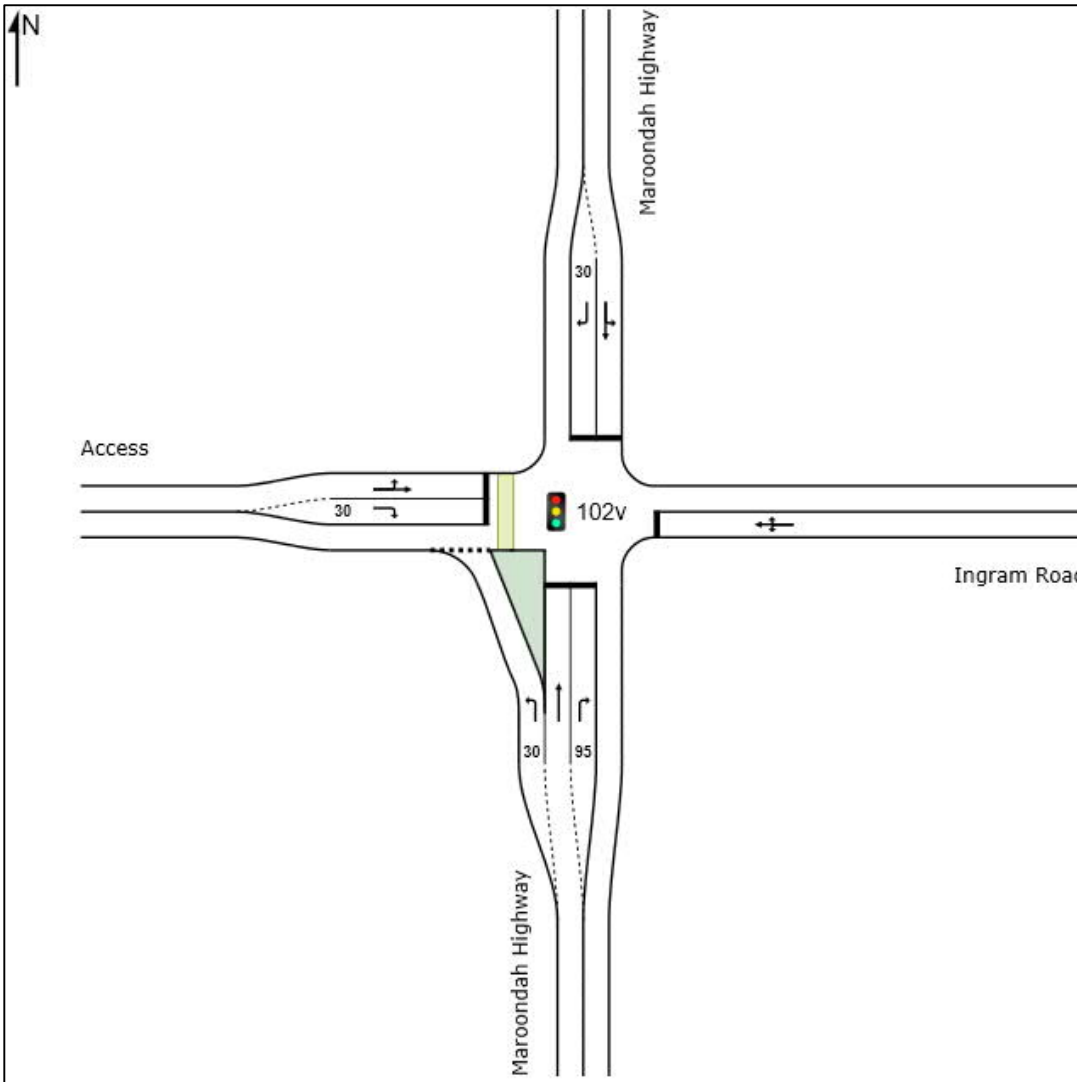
SIDRA layout for the Maroondah Highway/ Ingram Road/ New access road intersection for Scenario 1 and Scenario 2 (interim layout)
